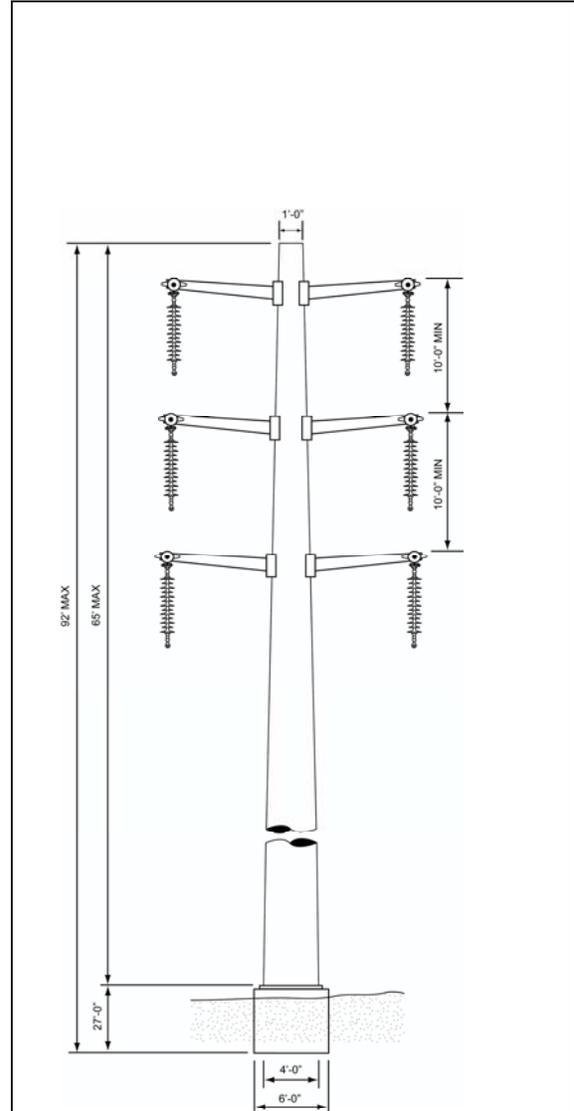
Typical tangent tubular steel pole with vertical configuration (Pole configurations are based upon preliminary engineering and may be subject to slight changes).
